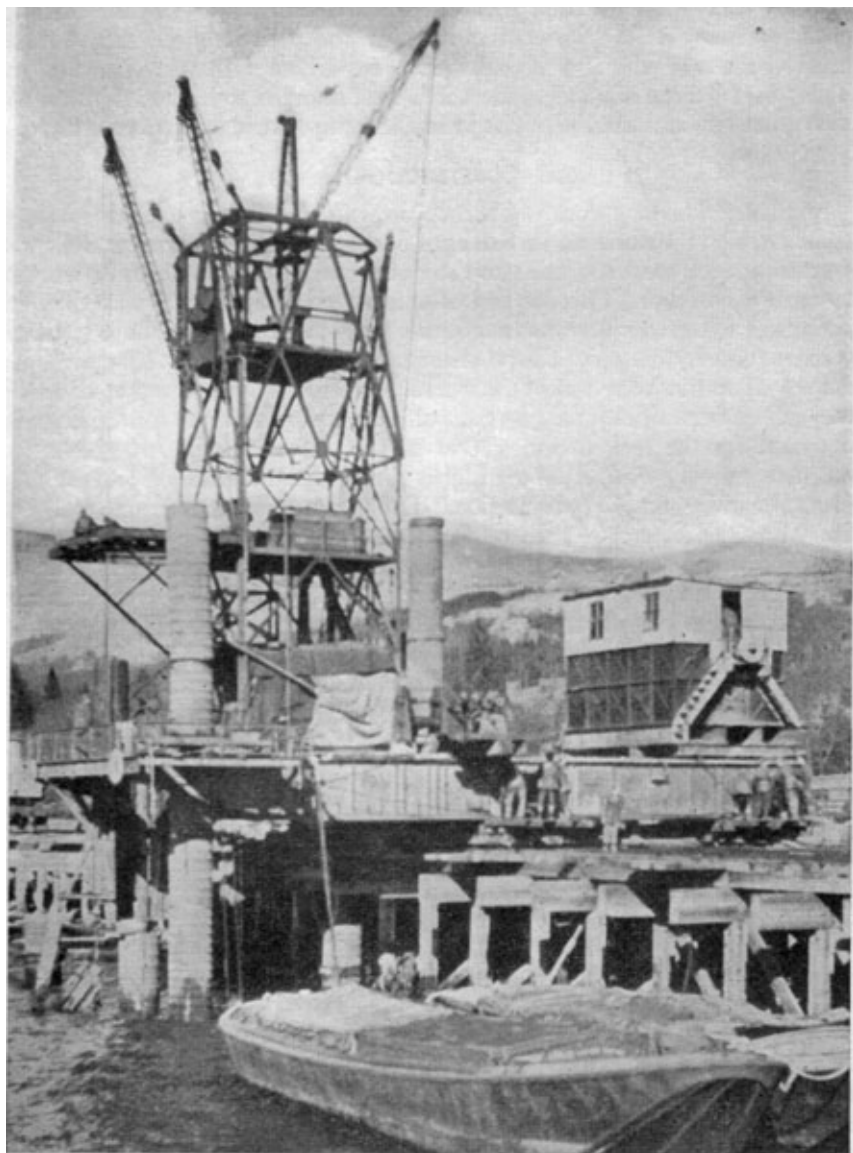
No. 1 Military Port. Screwcrete pile fixing machine with two piles assembled.
